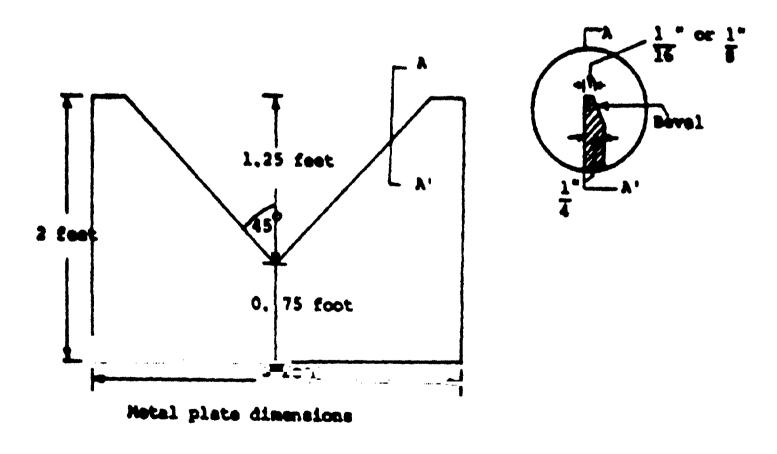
DETAIL PLAN & DIMENSIONS FOR A 1.25 FEET 90° V NOTCH WEIR
